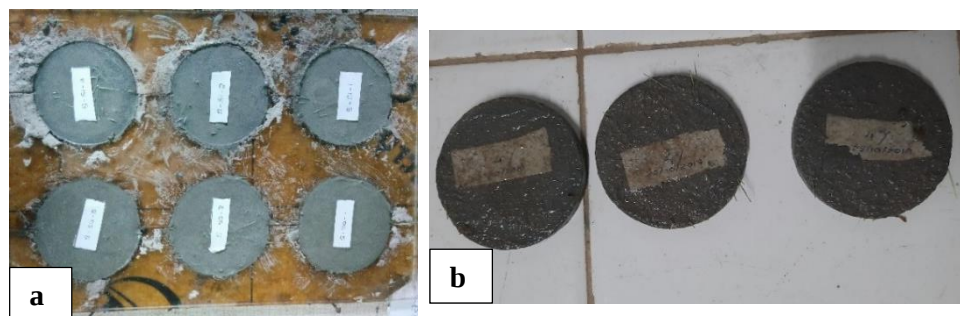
(a) Casting samples in the mould (b) Casted samples
